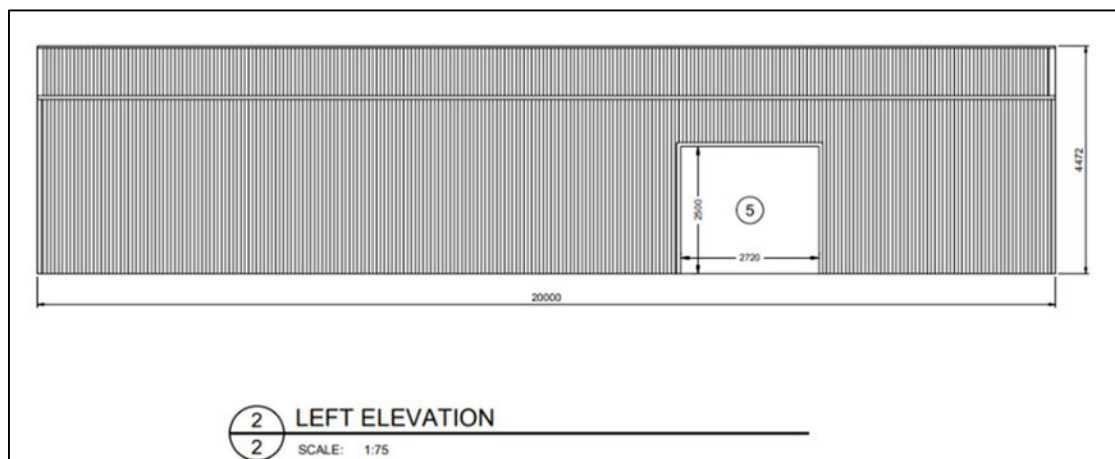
Left Elevation Prepared by Emerald Design and Construction (Appendix 2)
